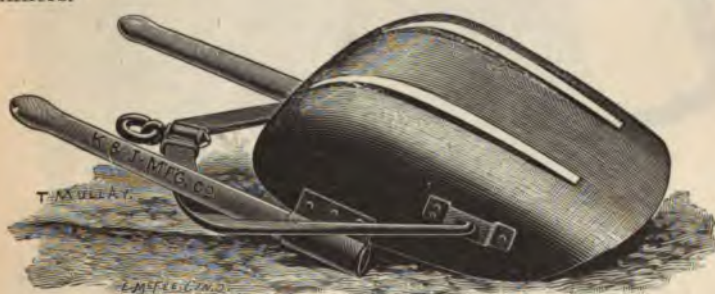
DRAG-SCRAPER WITH RUNNERS.
